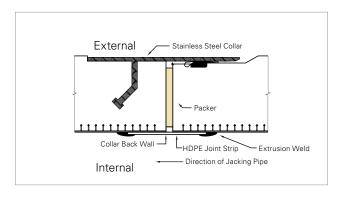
Illustrating BJ, SS Collar, Stirrups, timber packer, Perfect® HDPE Liner and HDPE internal joint-strap completed post installtion.
